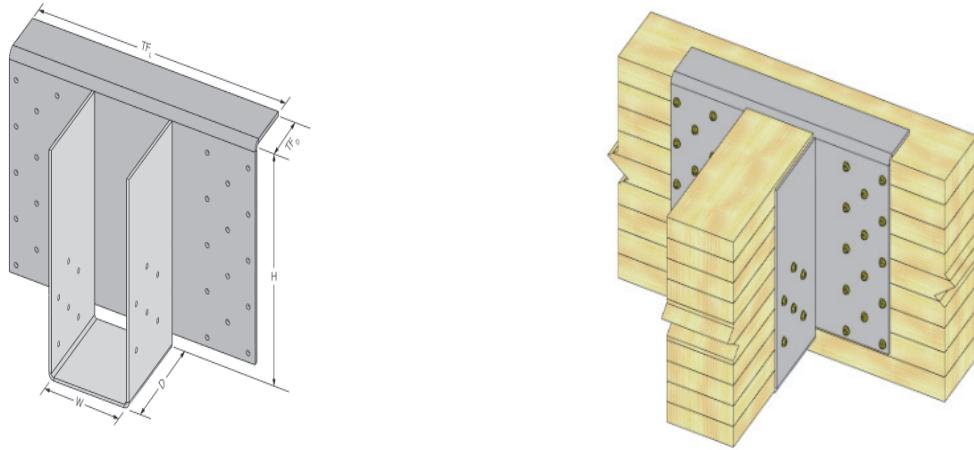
KEGQ TOP MOUNT GIRDER HANGER AND TYPICAL INSTALLATION DETAIL
